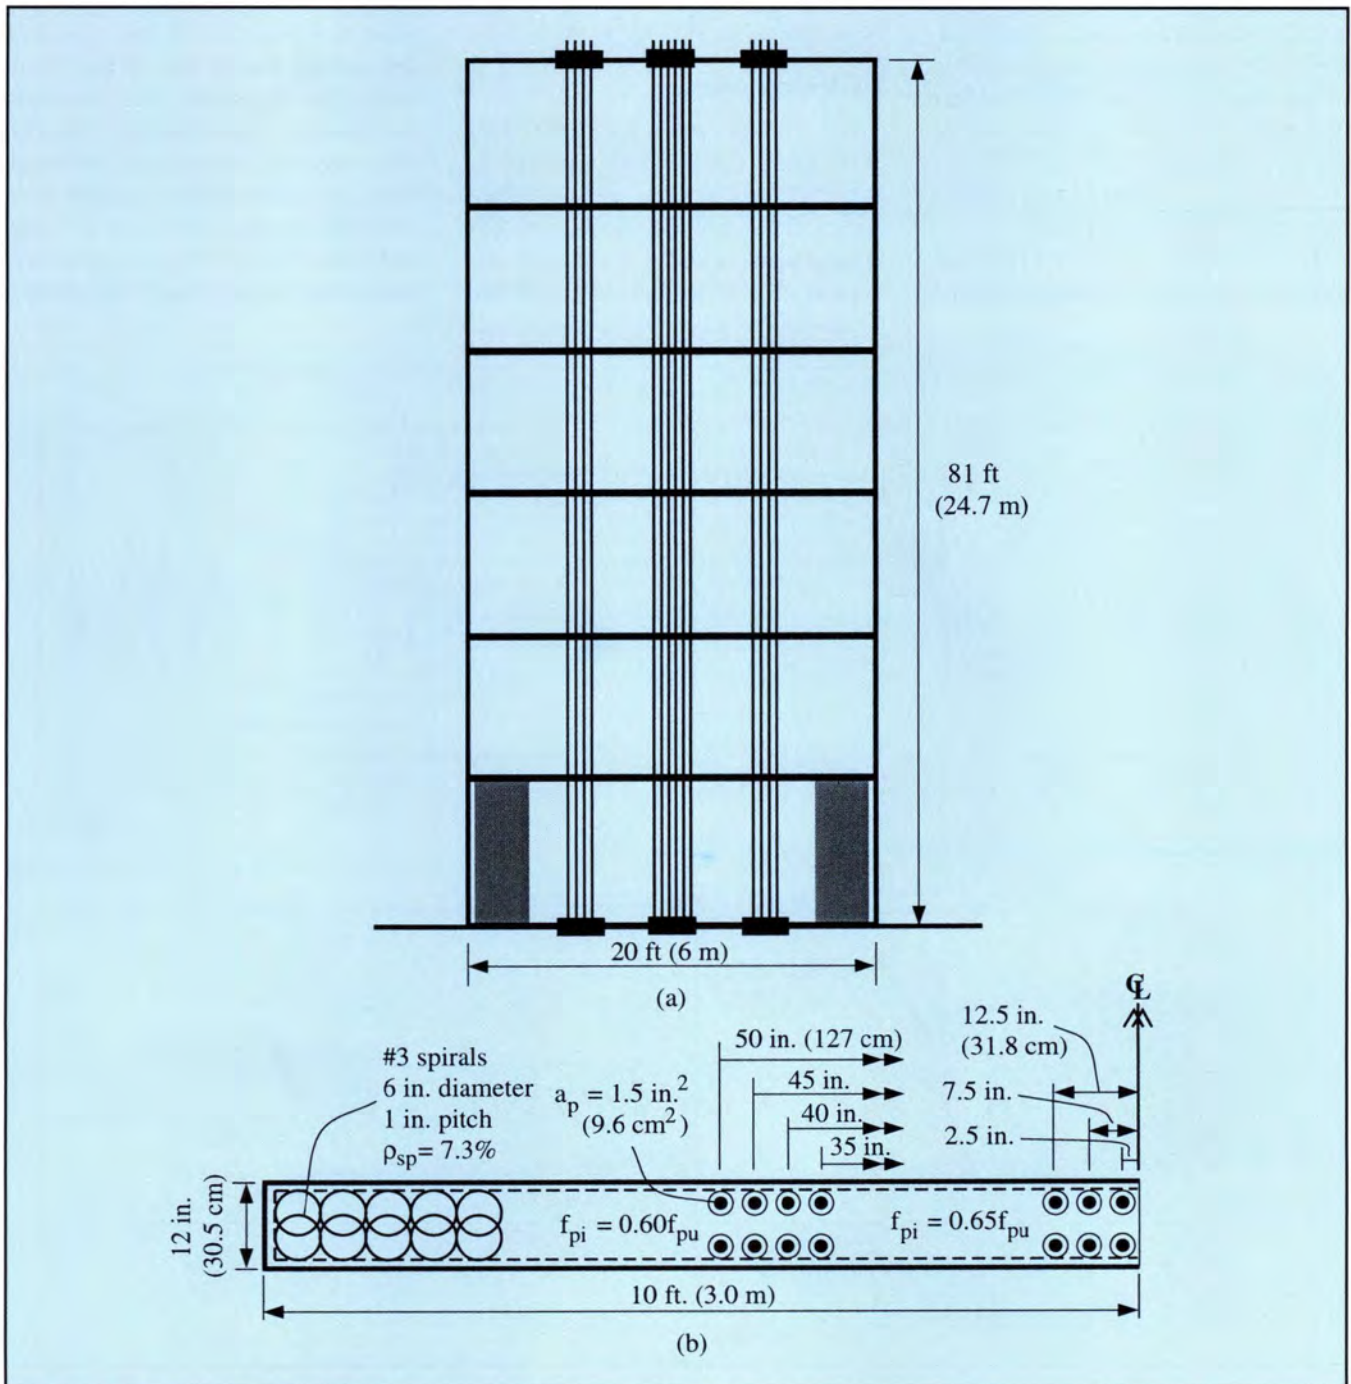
Properties of Wall WH1: (a) elevation; (b) cross section near base (enlarged).
